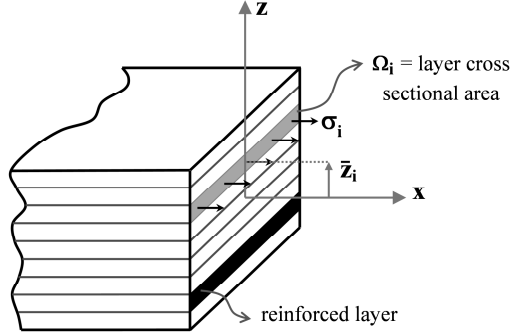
Multilayer discretization of a Bernoulli beam section
